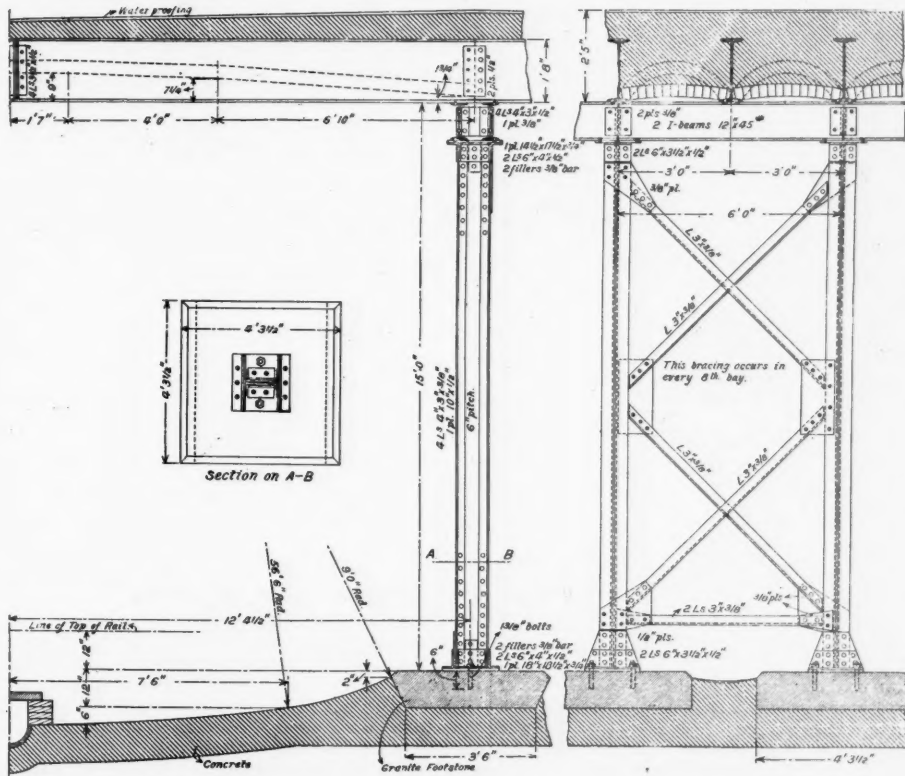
Section of Four-Track Subway, Showing Center Post.
